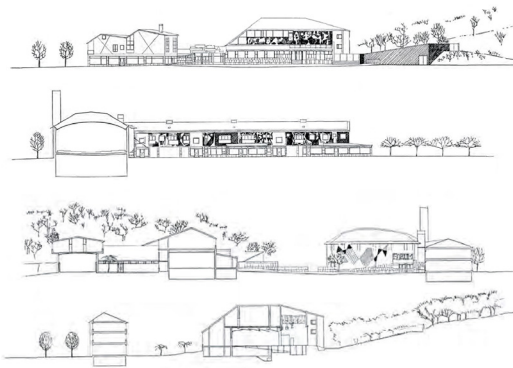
Erik and Tore Ahlsén. Elevations and sections of the urban center of Årsta, 1947-1953. Ahlsén, E. & Ahlsén, T. (1954) Årsta Centrum, centre of a new Stockholm suburb of 25,000 inhabitants. Byggmästaren, A 12, 269-296.
